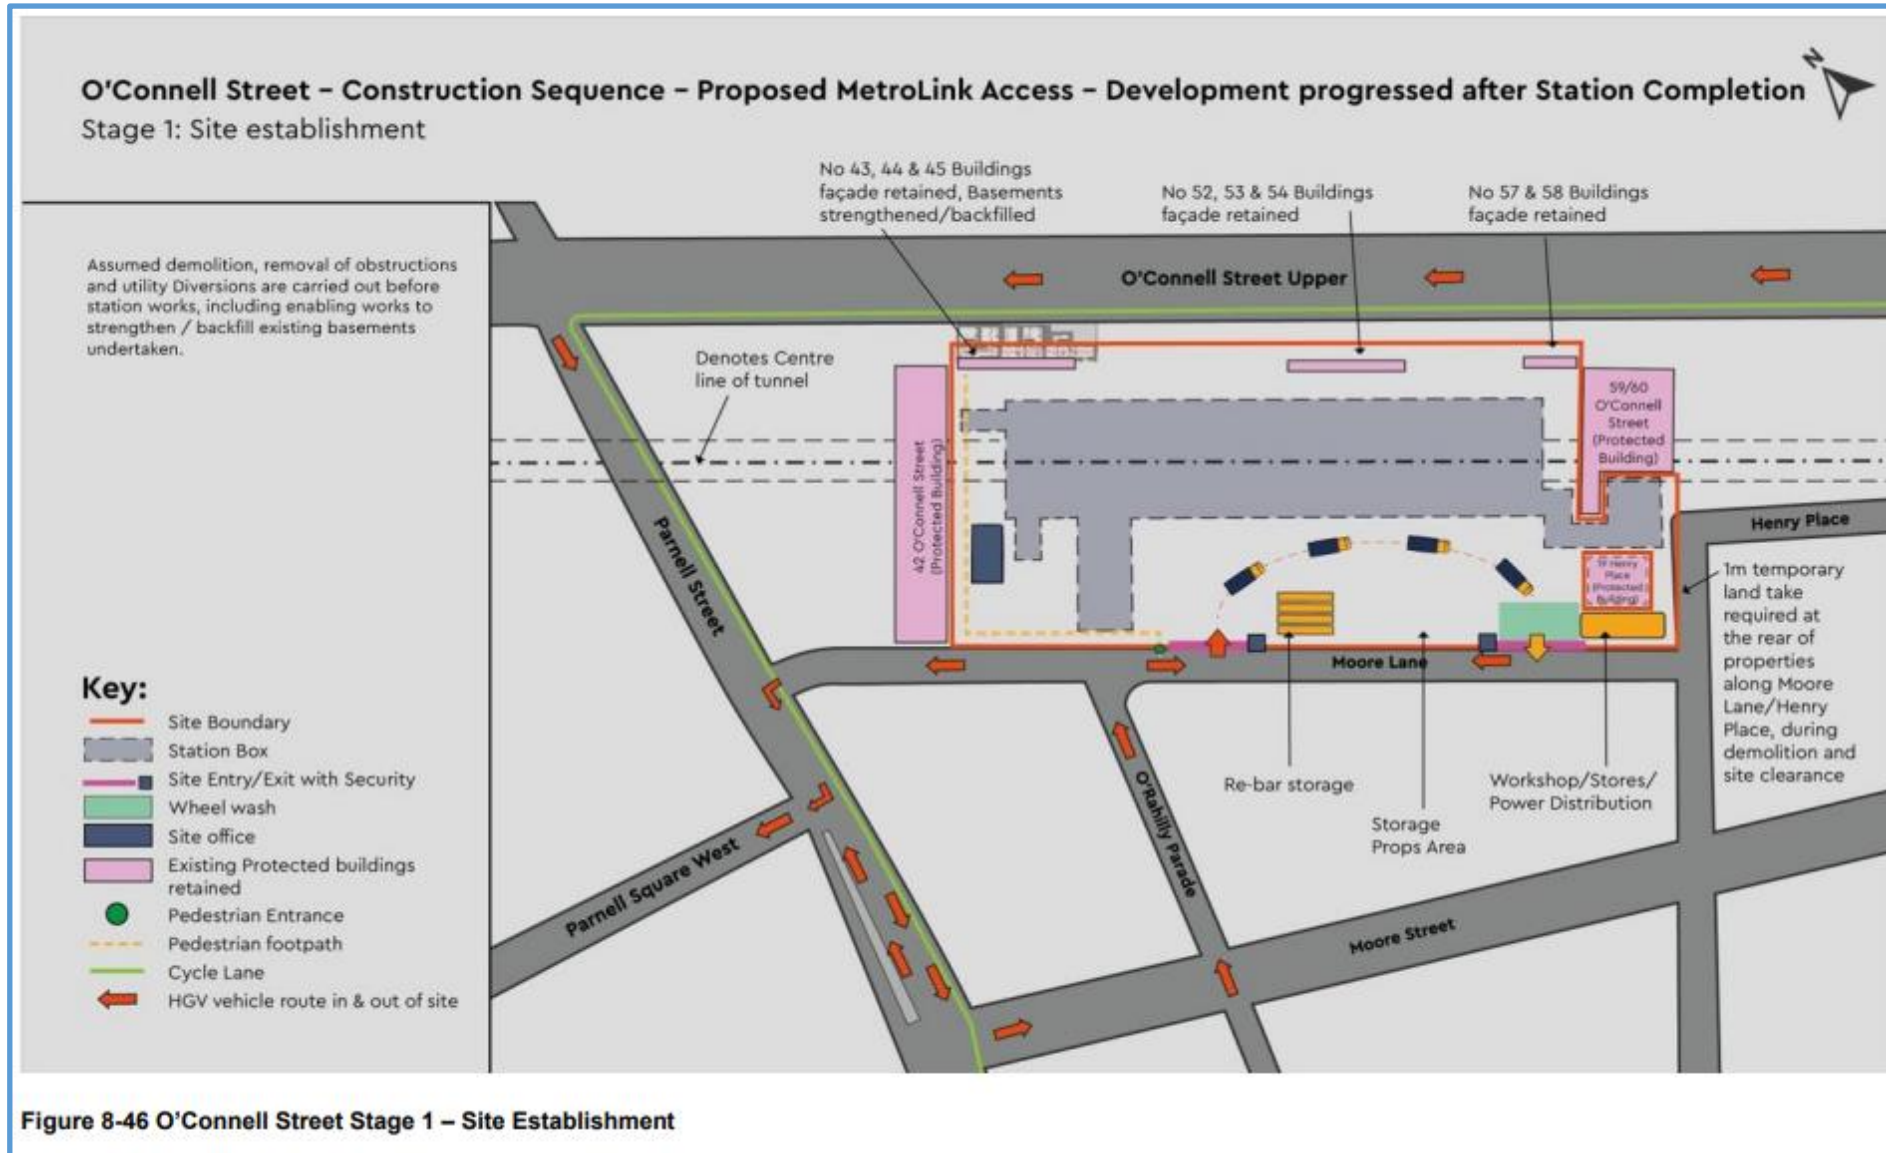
O'Connell Street Stage 1 – Site Establishment
